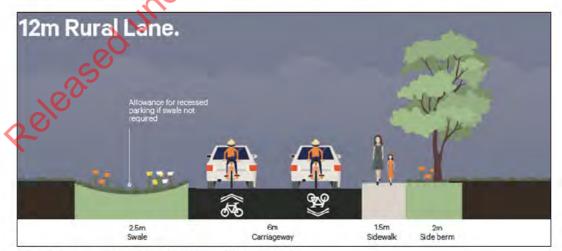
Proposed Cross Section – 12m – Road E Source: Isthmus
